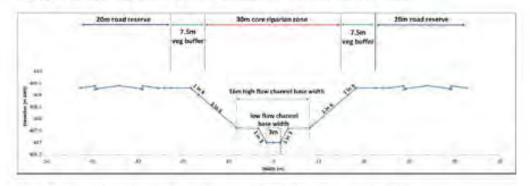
Conceptual arrangement of a typical cross section for a 45m wide waterway corridor
